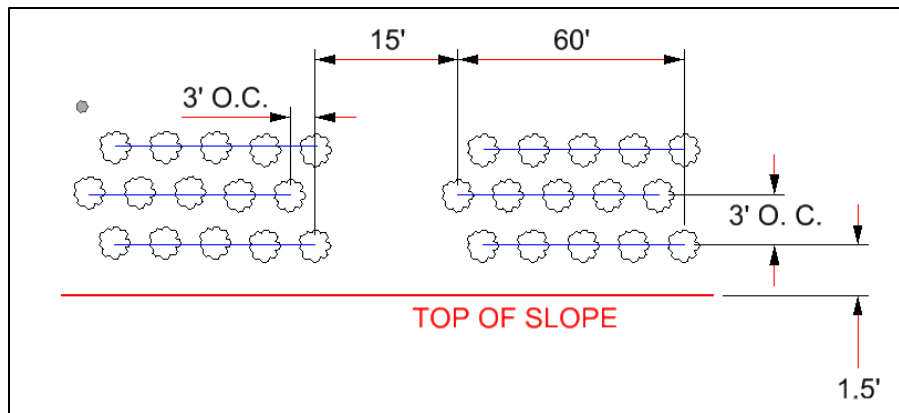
Planting plan along the upper slope of the proposed repair. Planting pattern repeats every 75 feet and consists of bare root plants.
